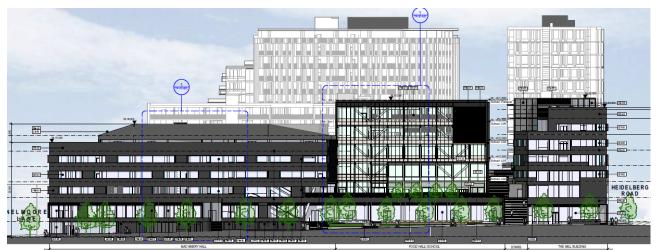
Proposed Mills Boulevard (Eastern) elevation
